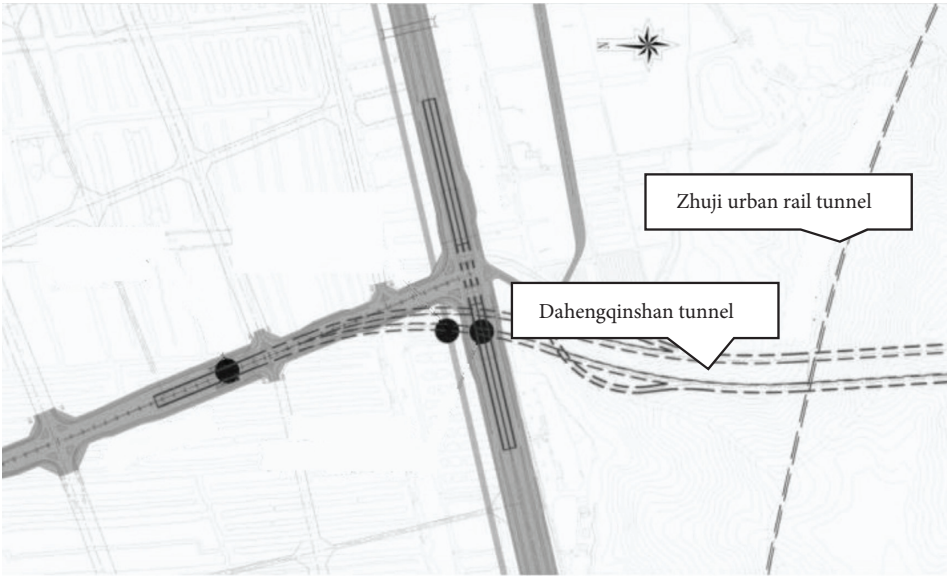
Plane position relationship between Dahengqinshan Tunnel and Zhuji Tunnel.
